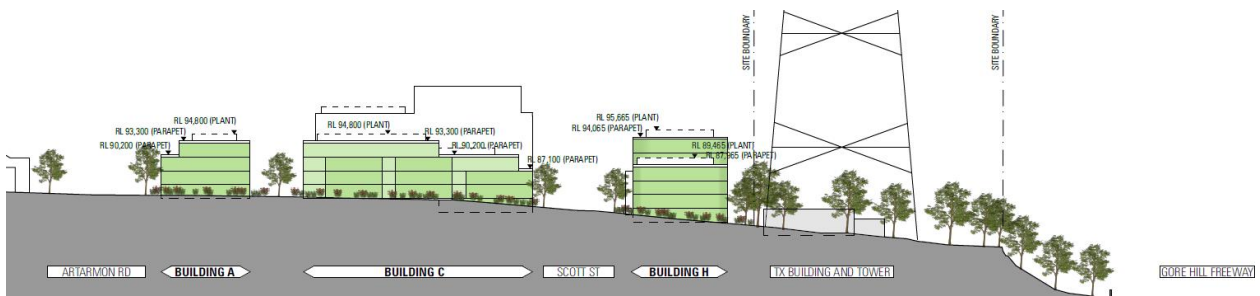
Extract of Existing Street Elevation – Richmond Avenue
